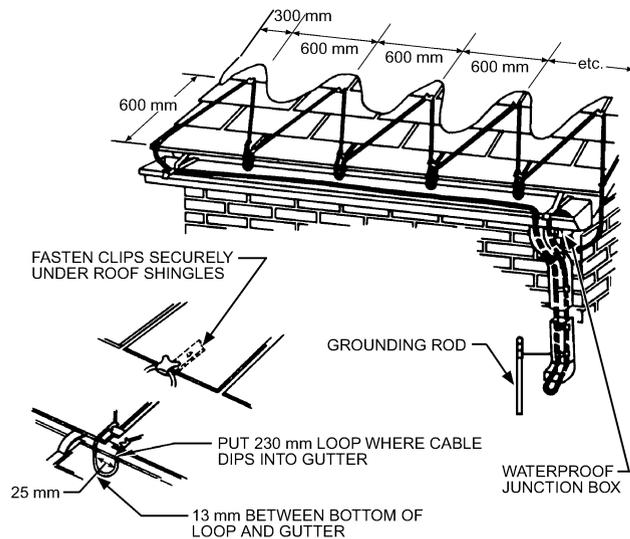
Typical Insulated Wire Layout to Protect Roof Edge and Downspout
